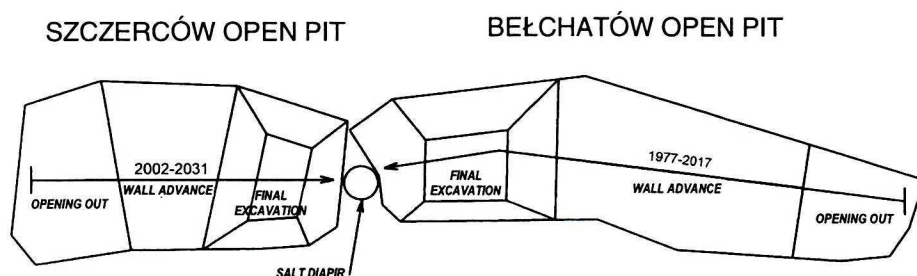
Sketch of opening out areas and final excavations of Bełchatów and Szczerców open pits.
